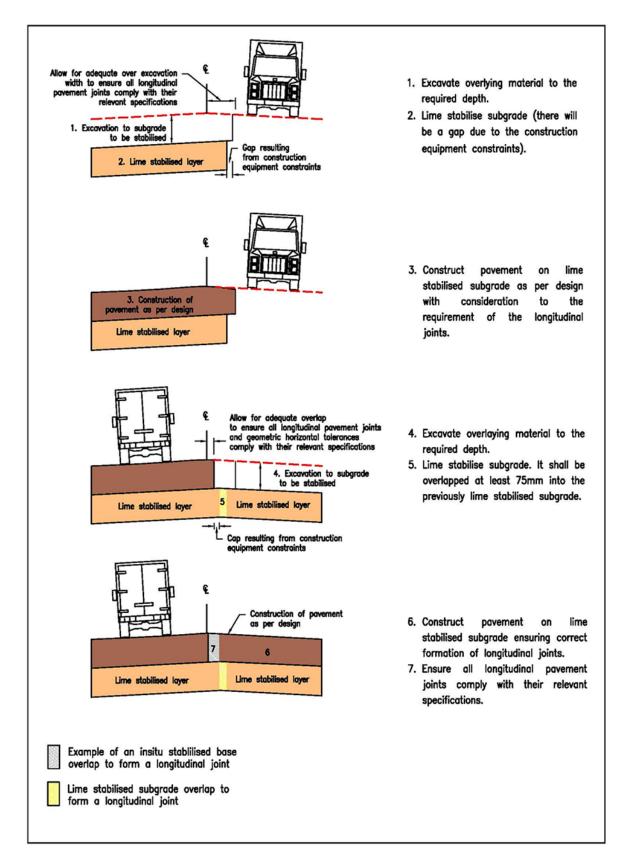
Typical construction process for multiple insitu stabilised layers
